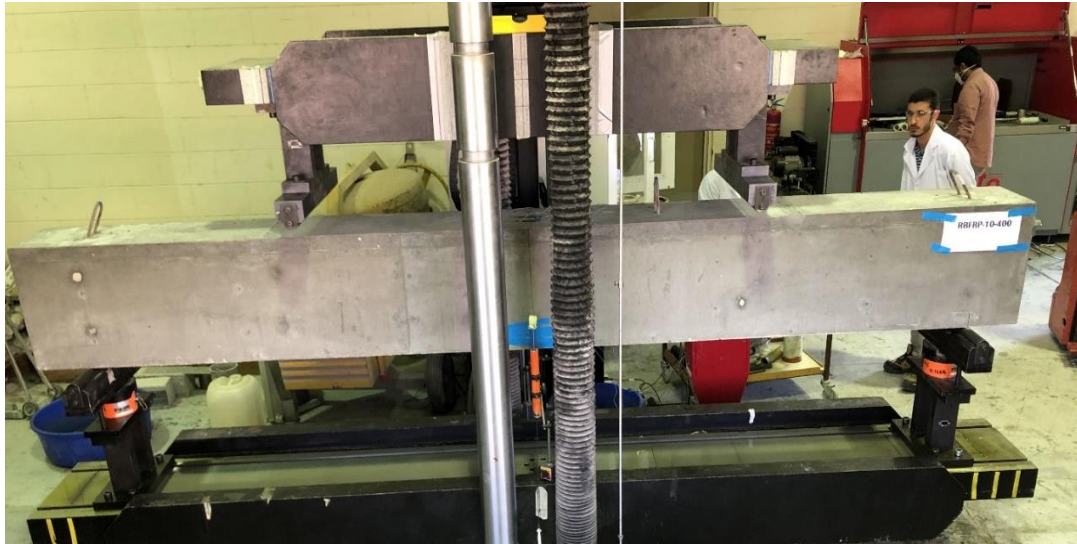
Beam 10 (HWBFRP-10-400) testing setup
